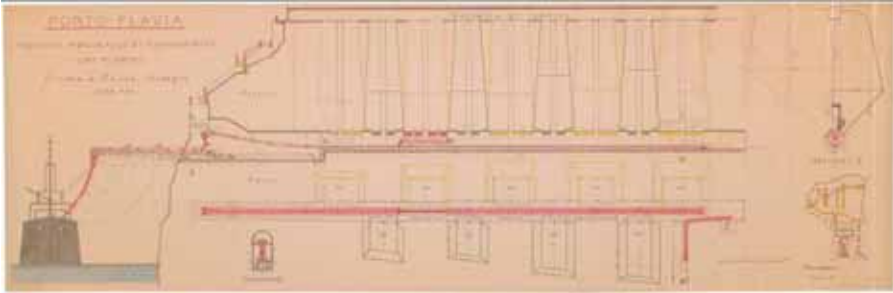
Project section, Ex-Distretto delle miniere Archive, Iglesias
